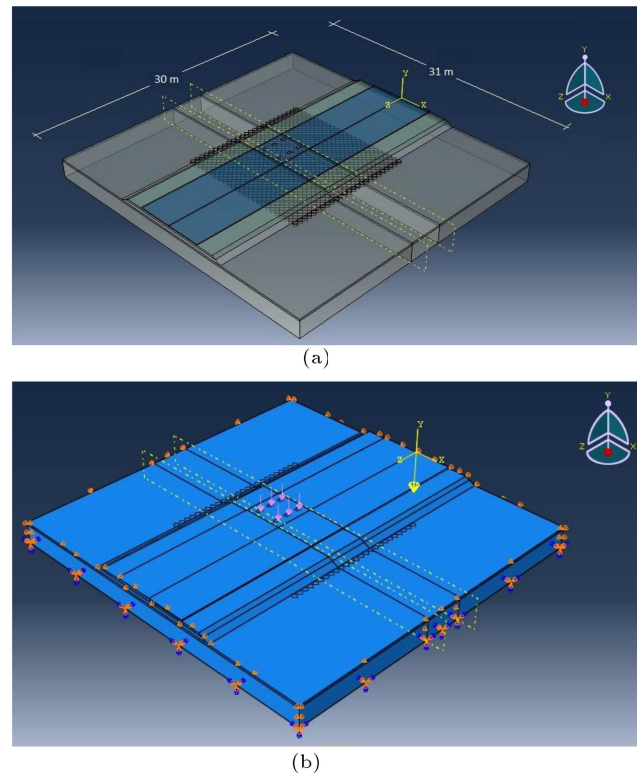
Three-dimensional view of geocell-reinforced model: (a) Reinforcement of subgrade and (b) loading and boundary conditions.
